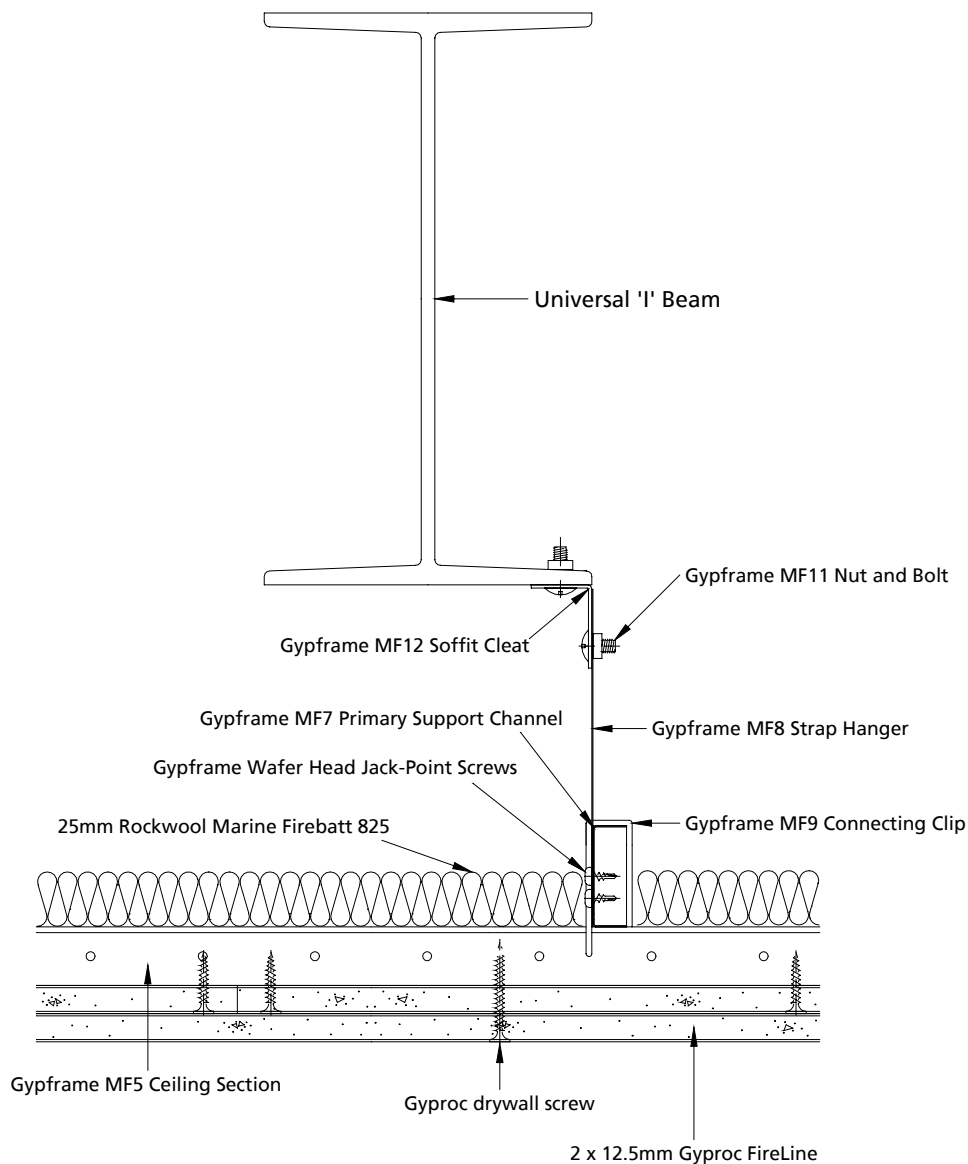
Cross-section of specimen showing British Gypsum Casoline MF detail.
